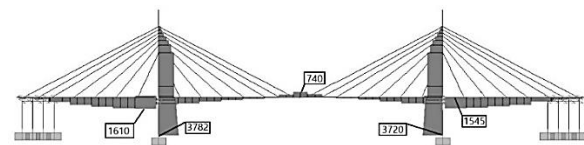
Axial force of girders and bridge pylons under initial cable tension and dead loads in model 2 (ton.m).
